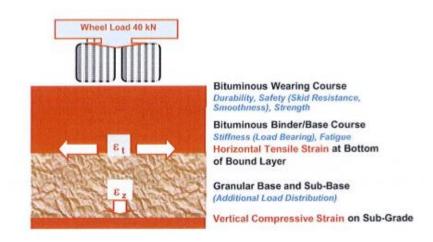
Components of failure mechanism in flexible pavement design
